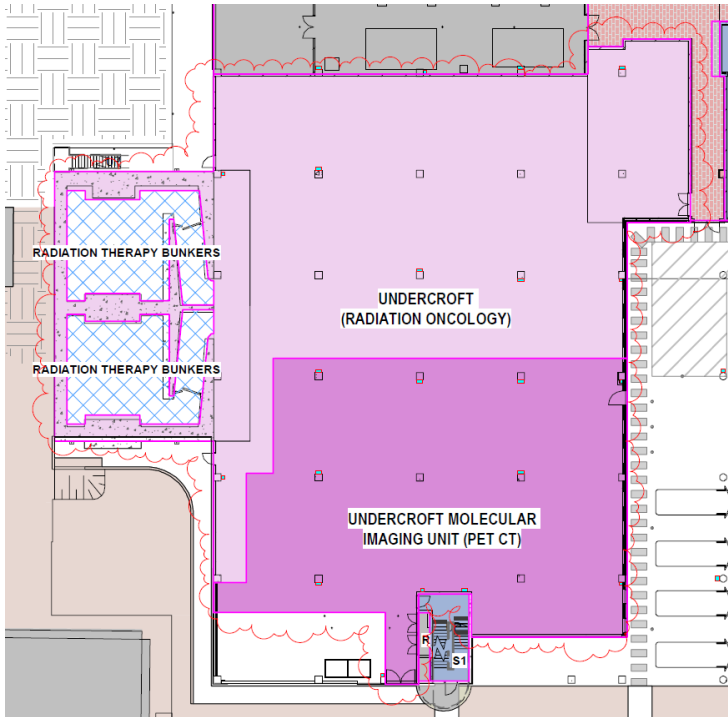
Overall Plan – Basement (Proposed Modification 6 Plan)
